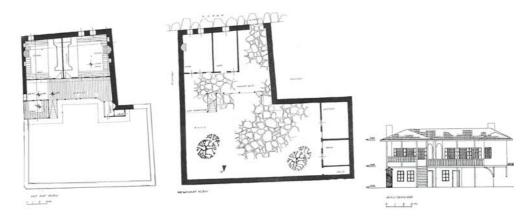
, *Çolaklar* Dwelling (Kula), plan and section (Tosun, 1970, 51-52)
